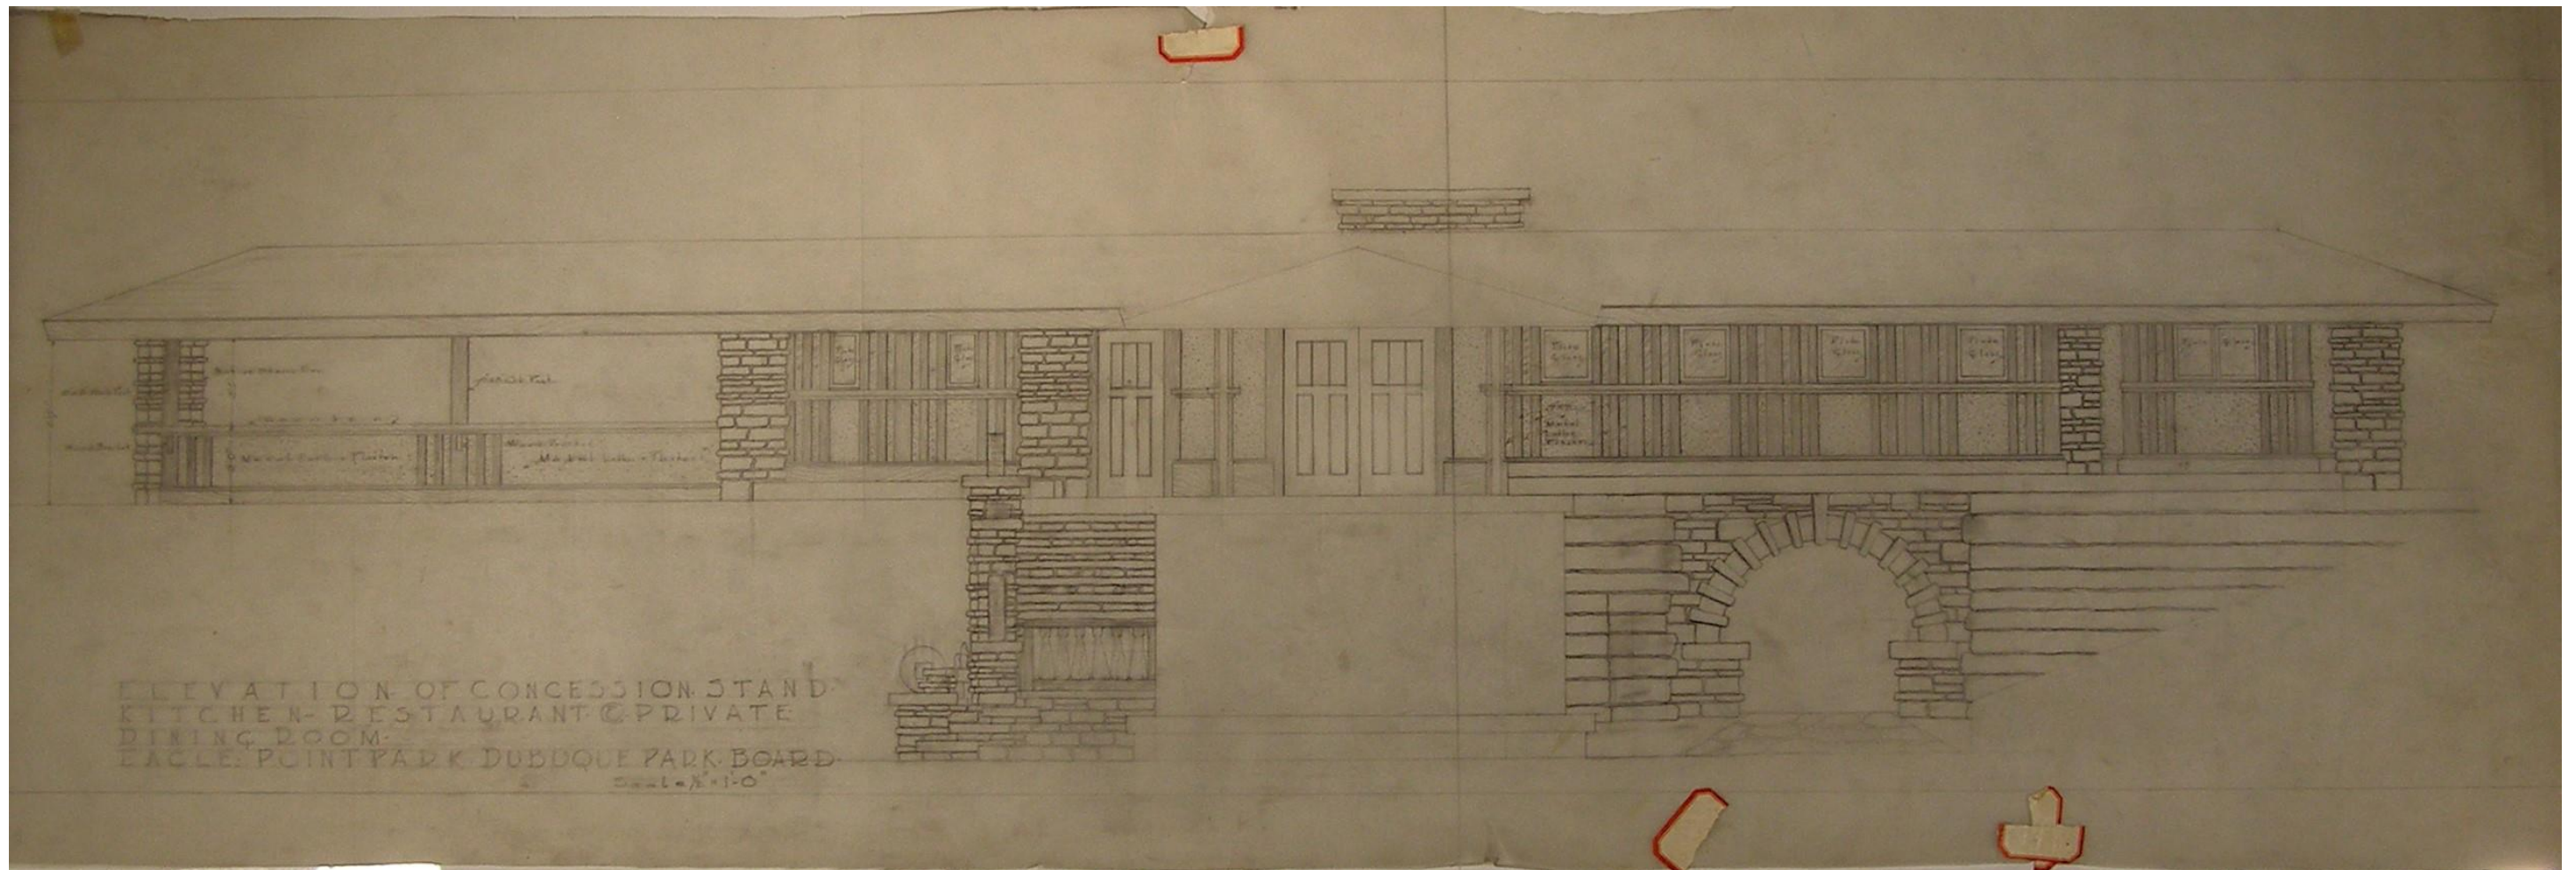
Original elevation of the Bridge Complex. (Source: Dubuque Museum of Art)
